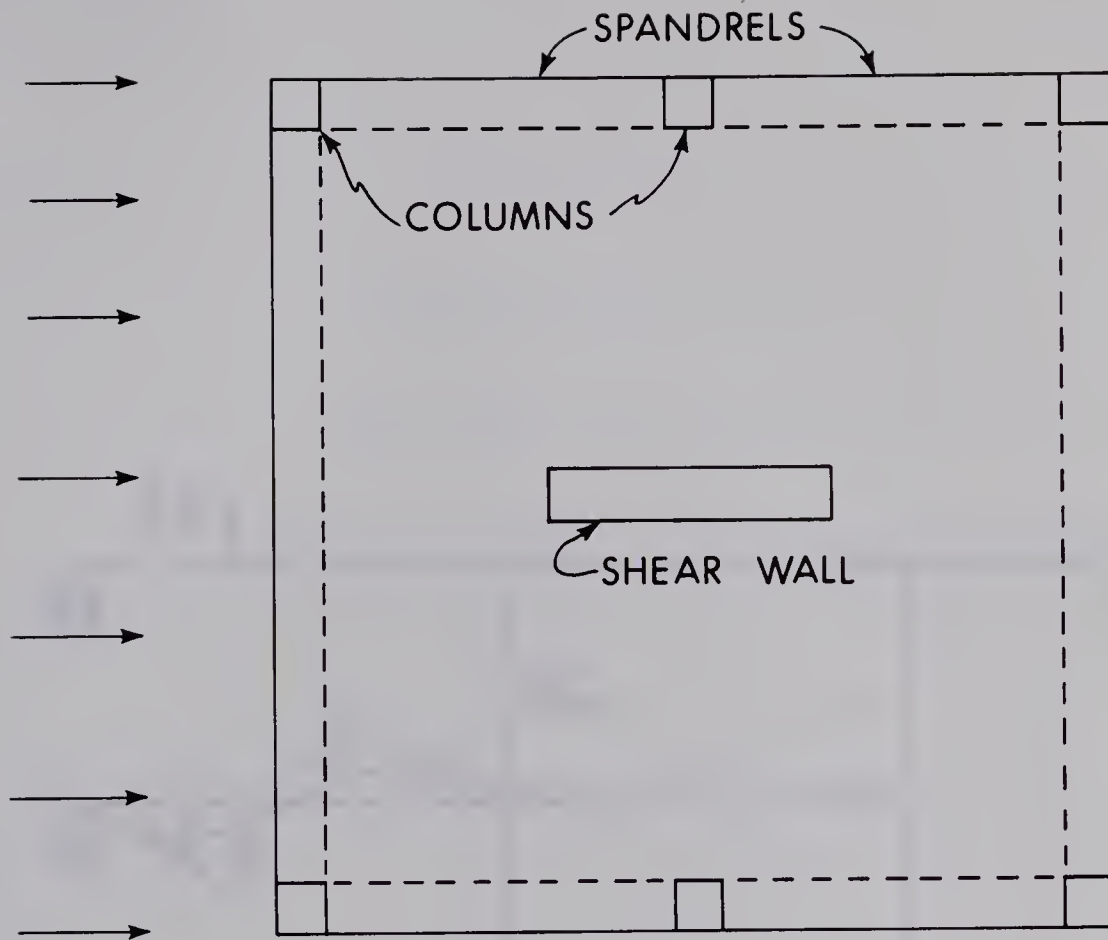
PLAN VIEW OF EXAMPLE BUILDING
